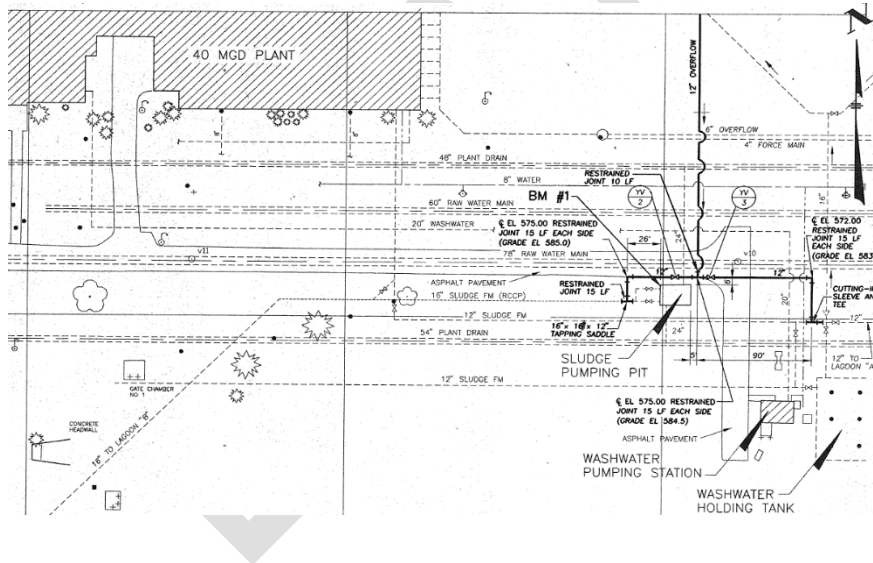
Potential Layout – 3rd New Sludge Press and Sludge Thickener
